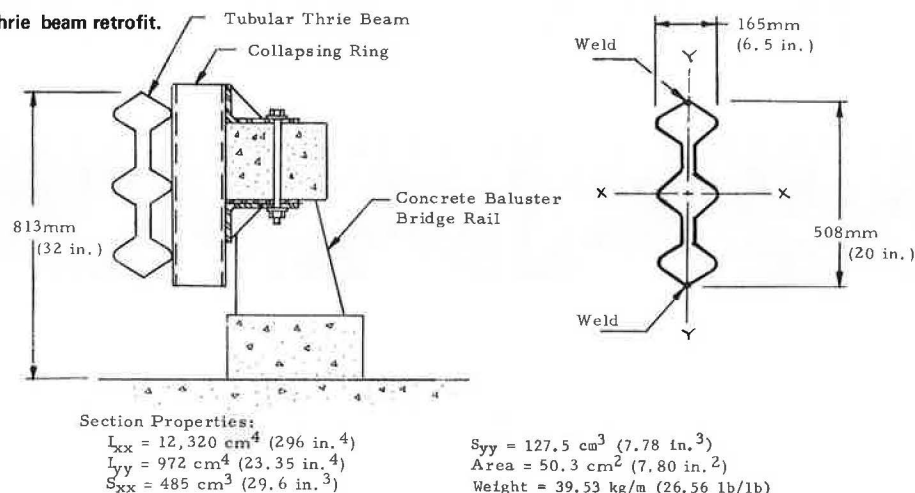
Concrete baluster rail with tubular Thrie beam retrofit.
